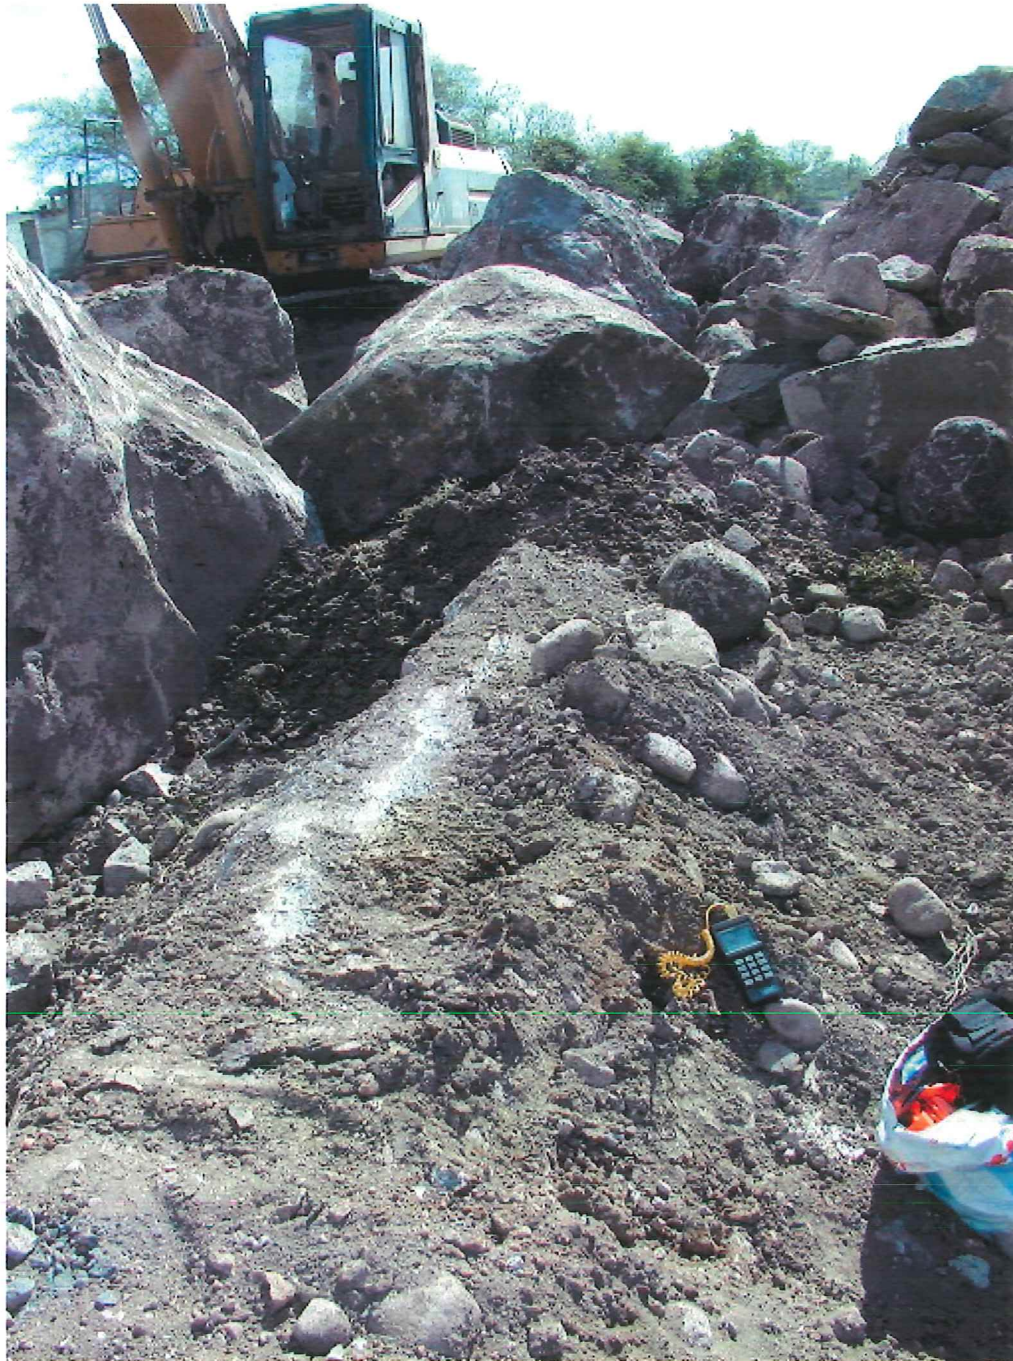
Steam escaping on the outside of the old concrete sea-wall. Measured temp 98,3°C.
